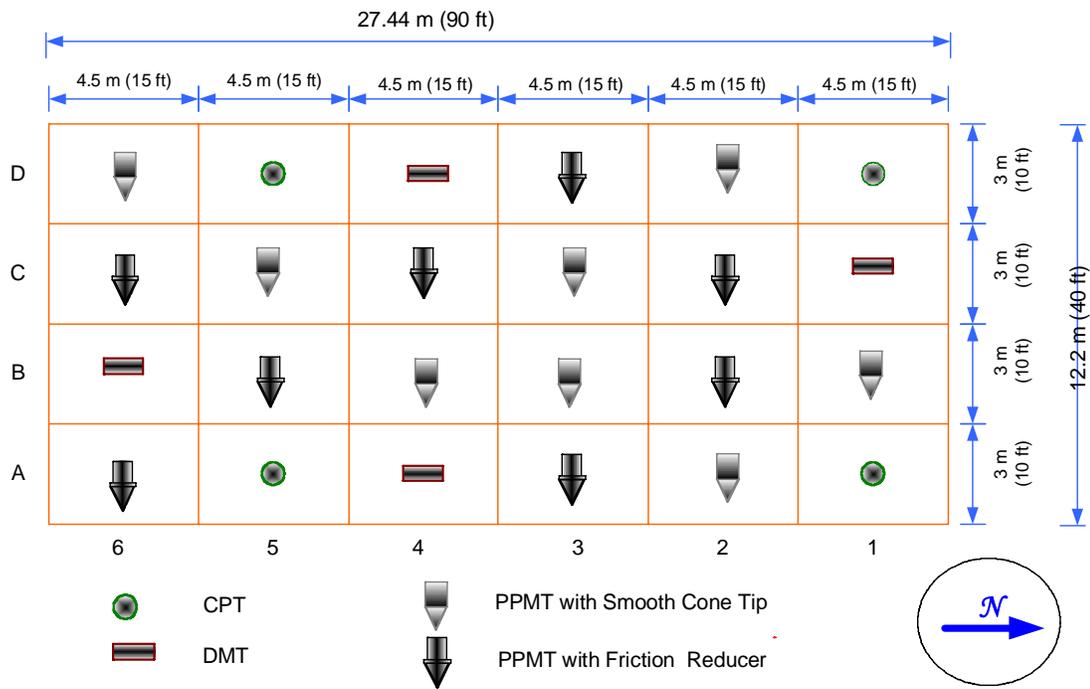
Testing plan for Puerto Del Rio site, Cape Canaveral, Florida
